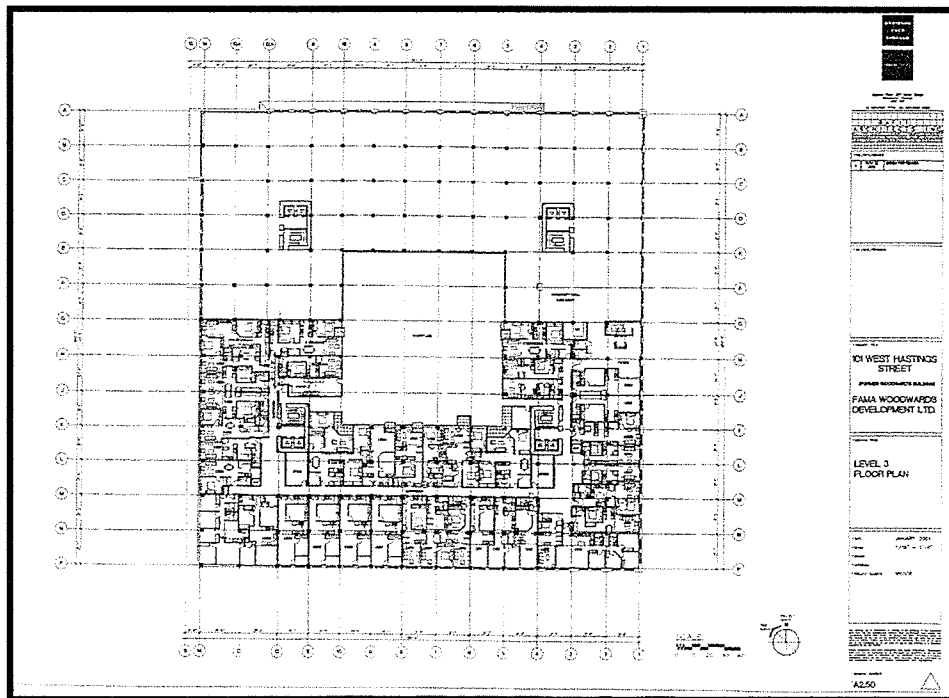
Level 3 Floor Plan compliments of Davidson, Yuen and Simpson
